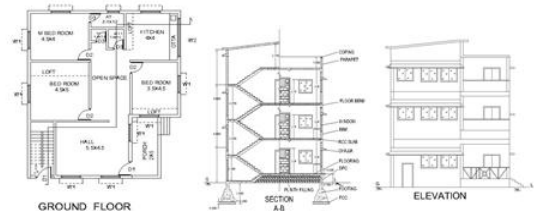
Typical layout of G+2 building with total built up area 161 sq.m
